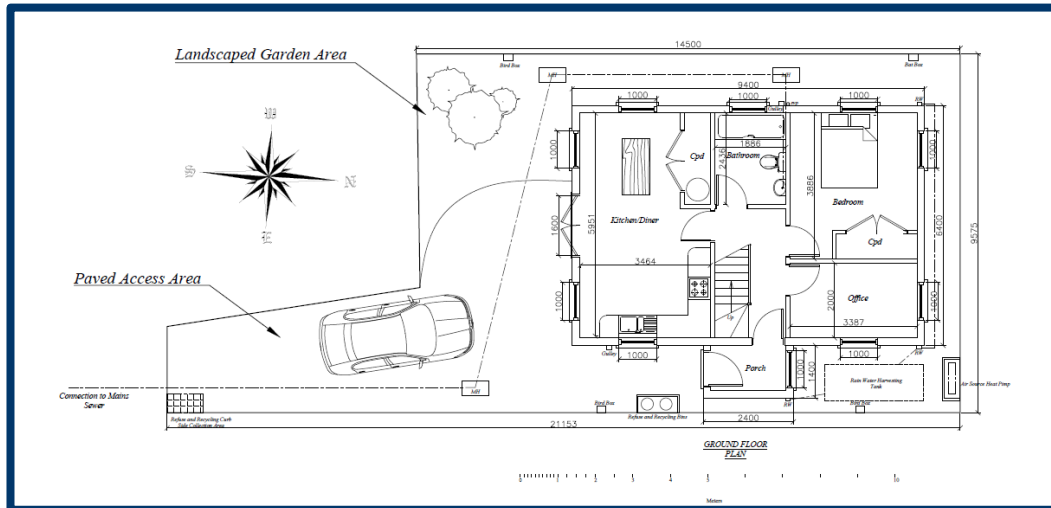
Proposed Site Layout (extracted from submitted plans)
